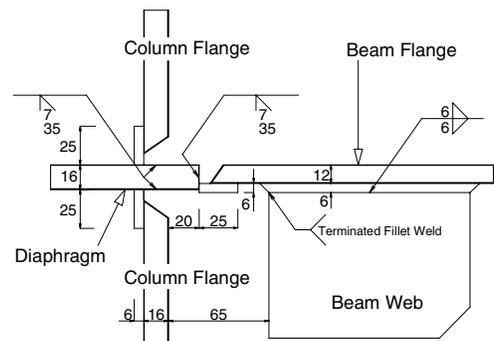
Detail of Diaphragm-to-beam Welding Connection
